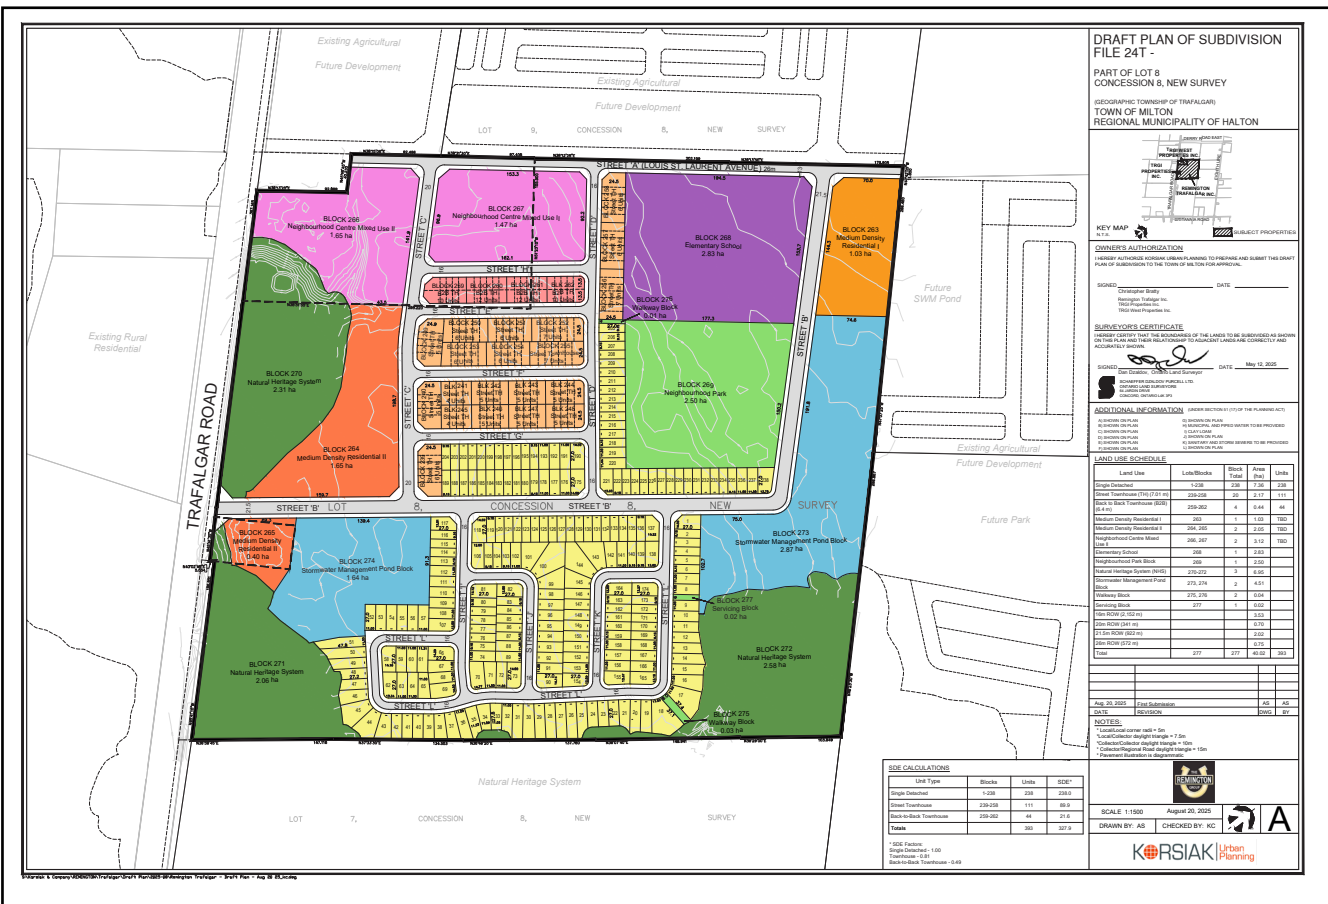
DRAFT PLAN OF SUBDIVISION
